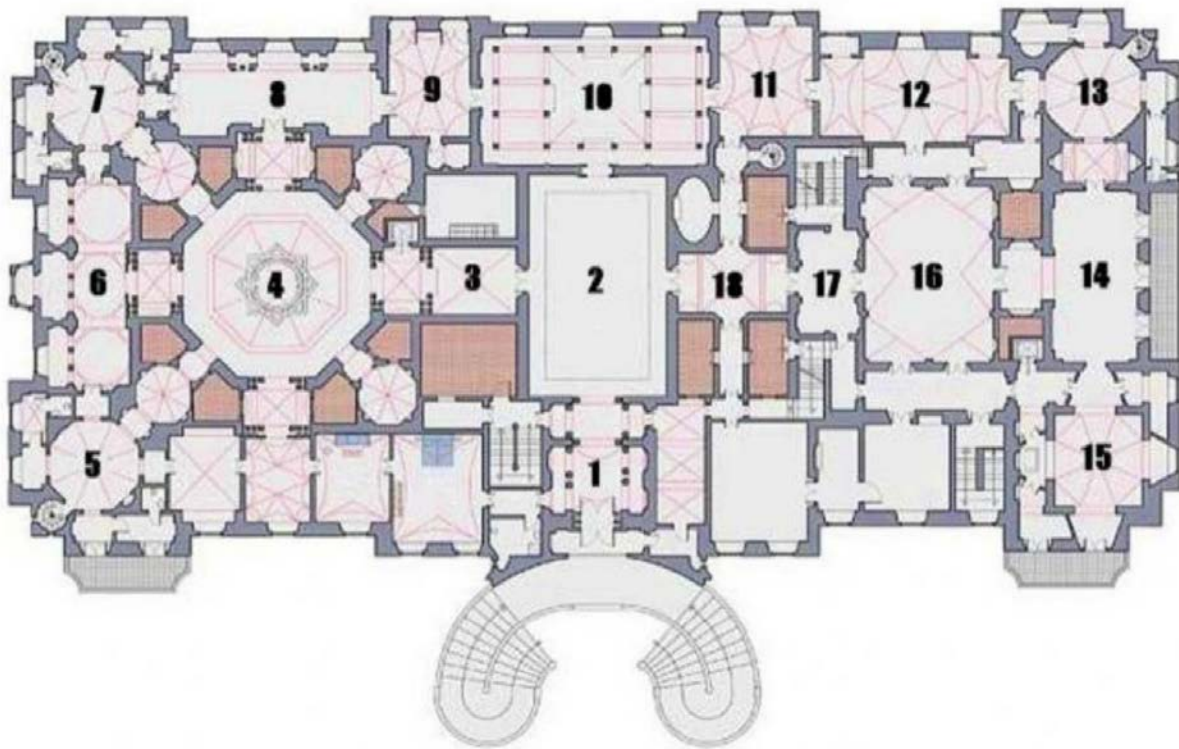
PLAN OF THE PIANO NOBILE AND ROOM CLASSIFICATION BY SAVE SAMMEZZANO
